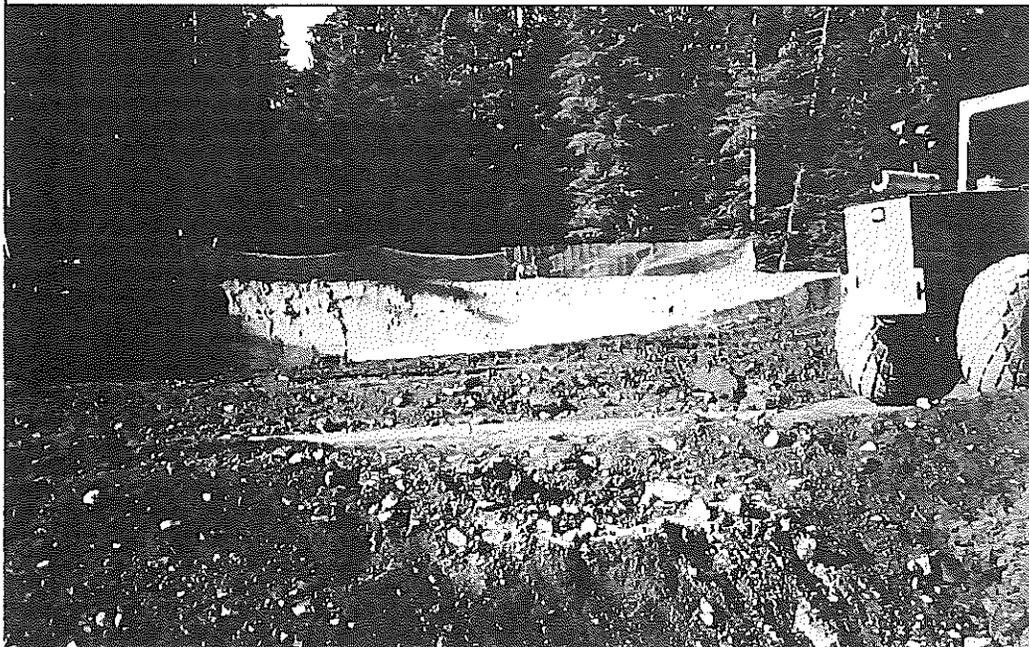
Historical Photo #131 – August 11, 1997 – Placement and compaction of embankment material at Devil's Dip near top of culvert elevation.
